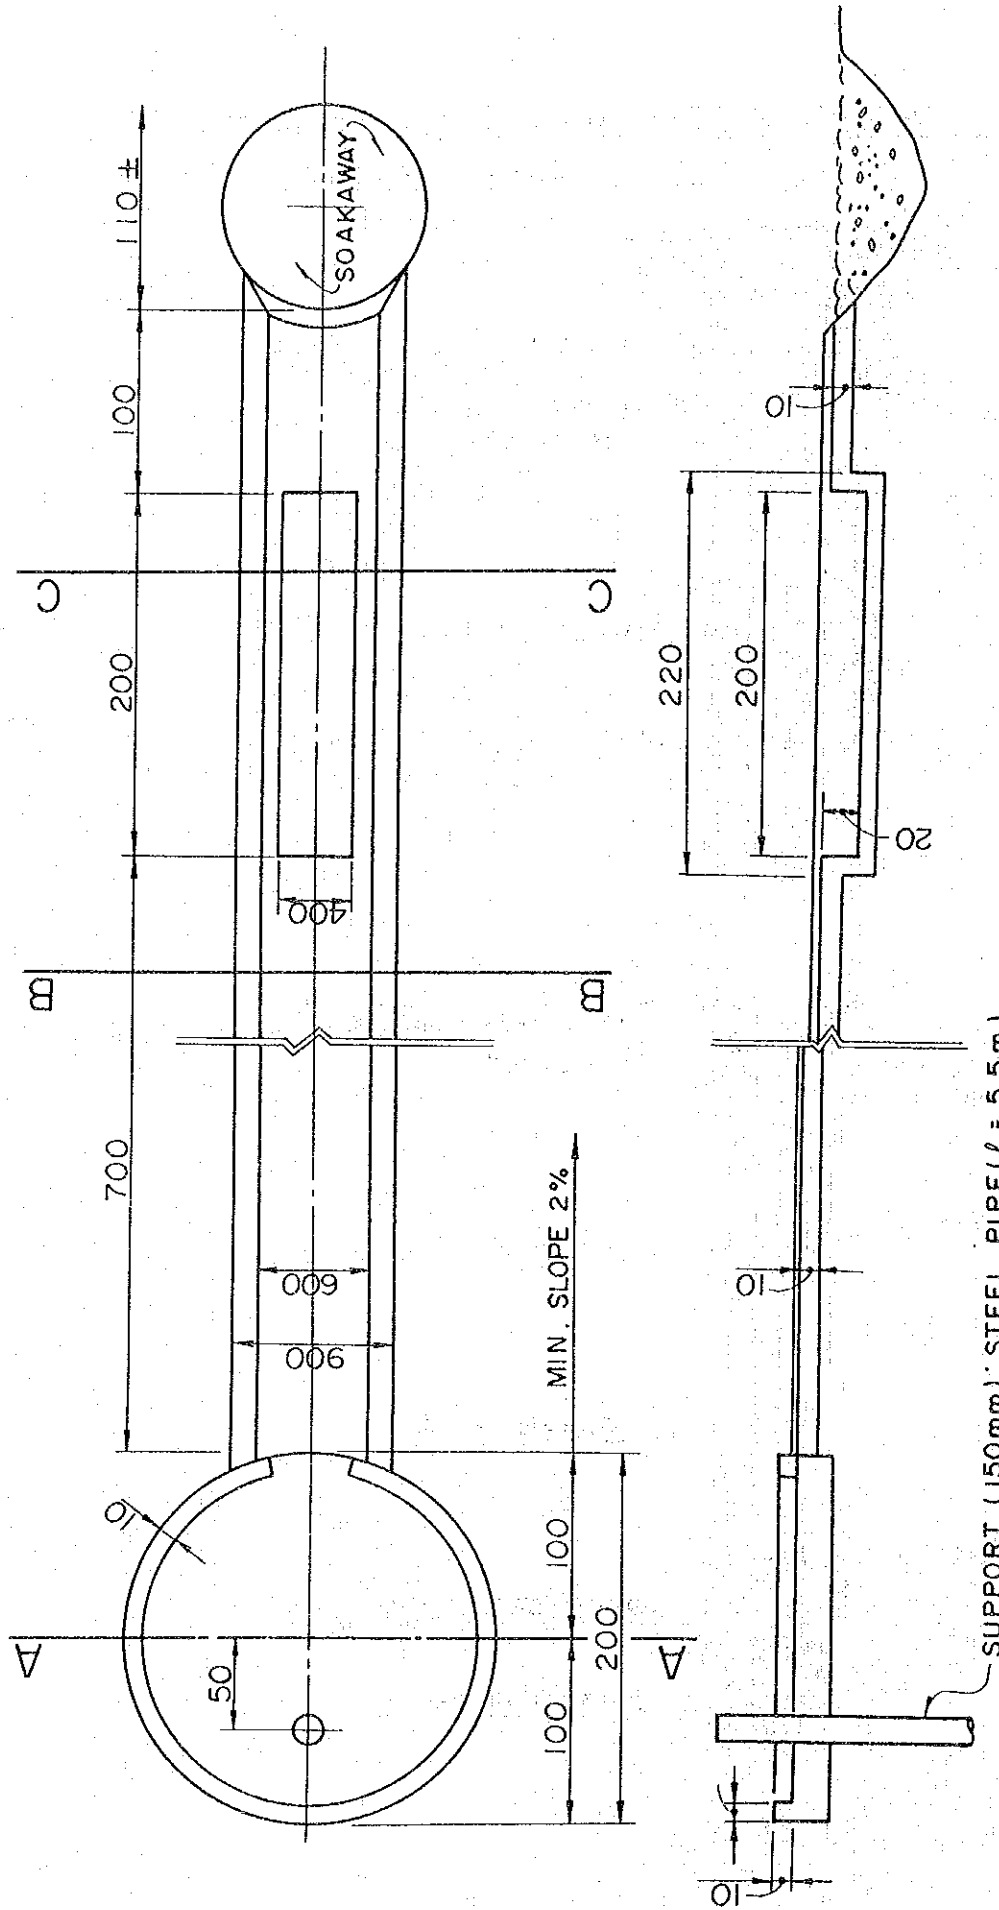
(1) PLAN AND PROFILE OF HEAD WORKS
